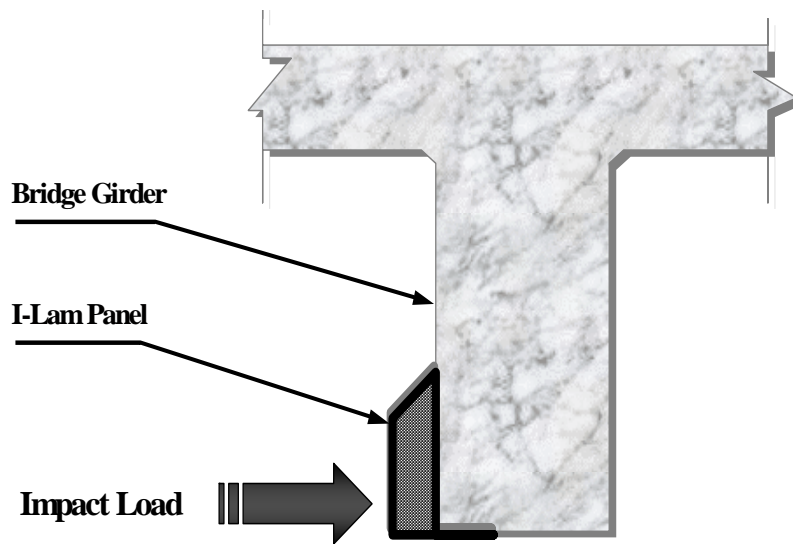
Over-height collision protection (scarifying) system for concrete girders
